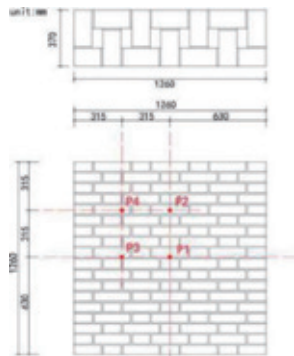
A Plan View of Brick Wall and Displacement Point on The Surface of Wall
